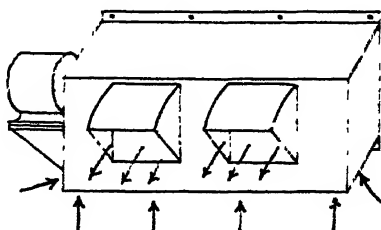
LARGE INDUSTRIAL TYPE FAN UNIT ELECTRIC HEATER
